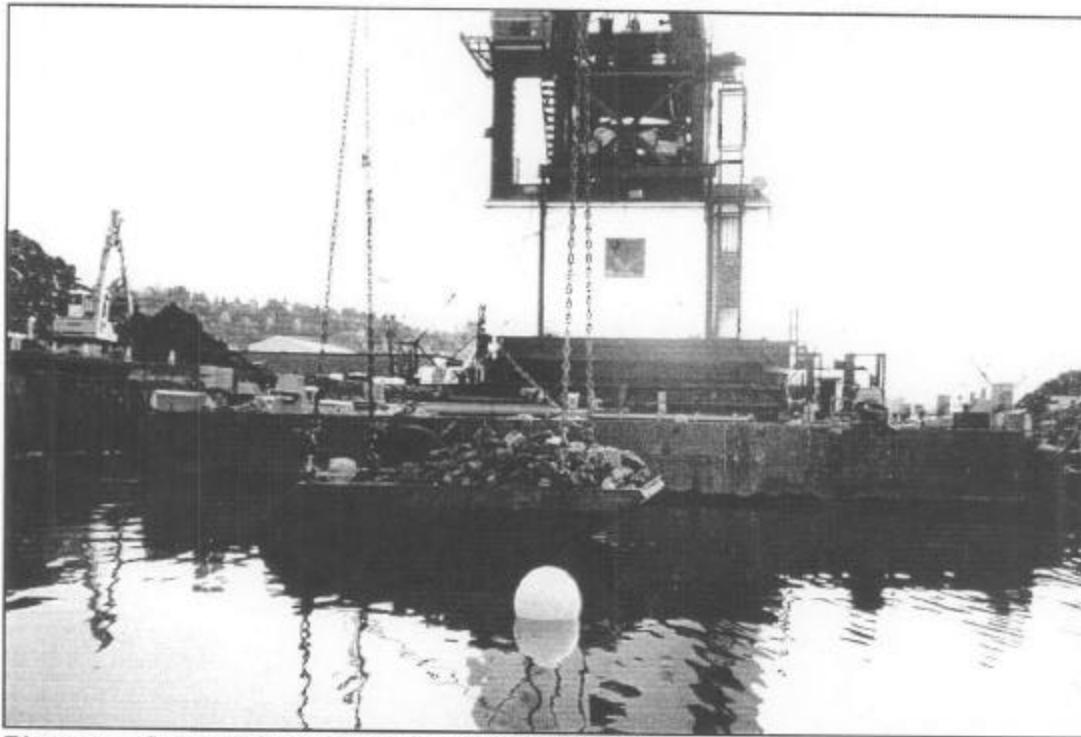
Quarry Spalls Used for Building Toe Berm
